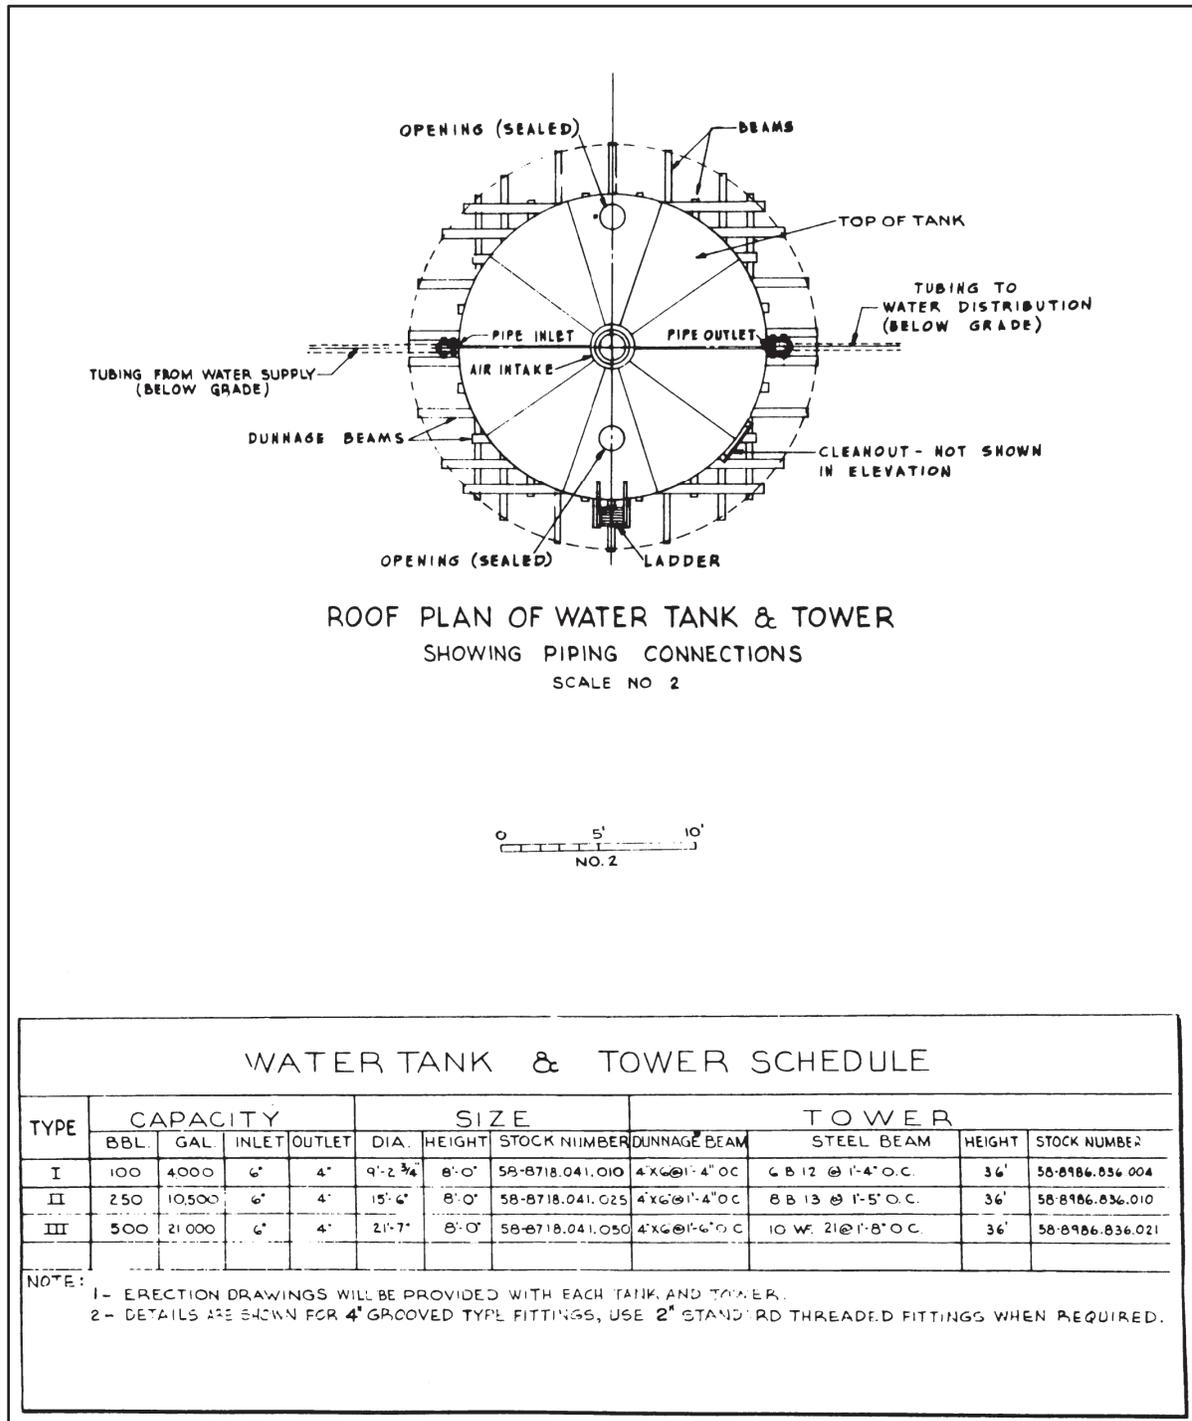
Typical water and tower detail plumbing diagram (continued)
